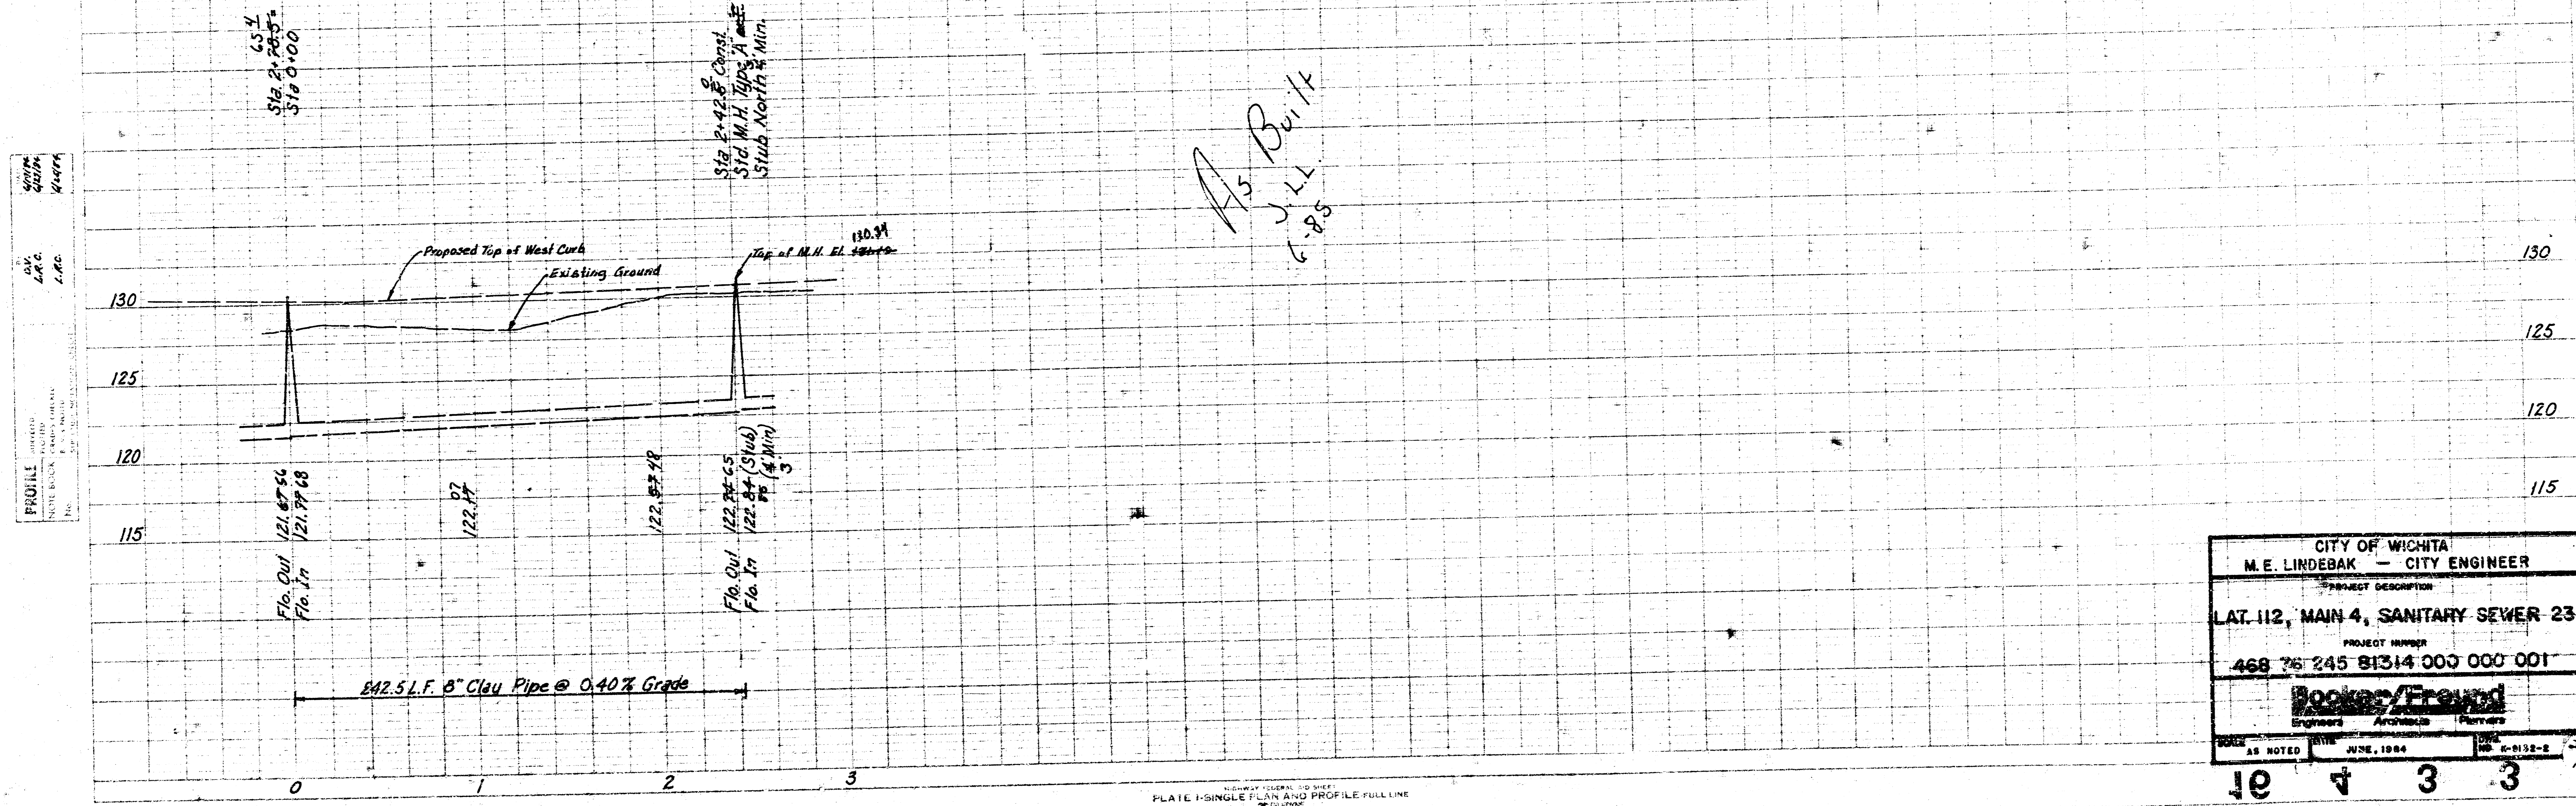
SINGLE PLAN AND PROFILE FULL LINE
